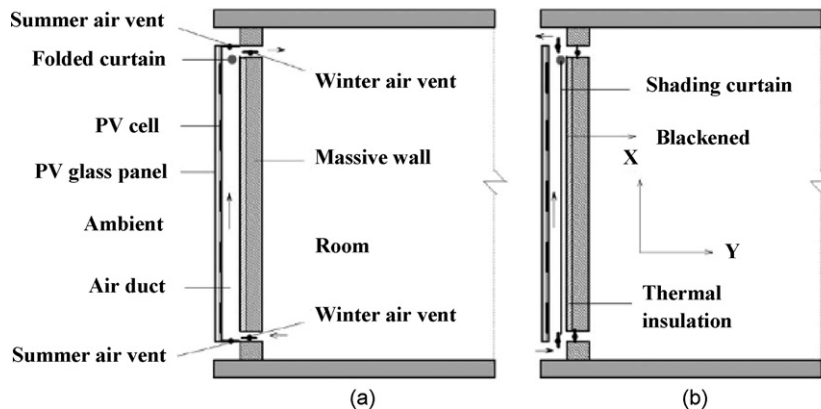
PV-Trombe wall for (a) winter heating and (b) summer cooling [3].
